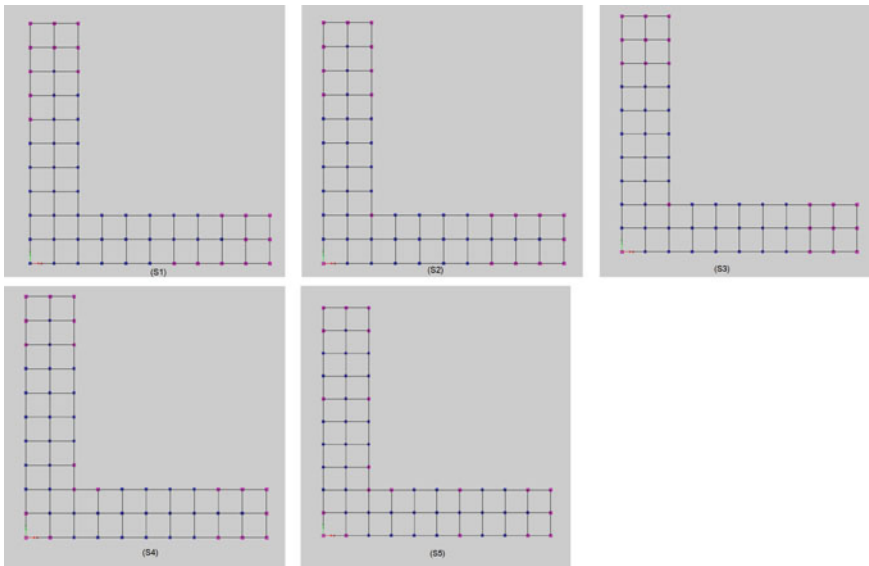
Plans of second set of models (S1 to S5) with various locations of bracings. Steel plate bonded column—pink box; RC column—blue box
